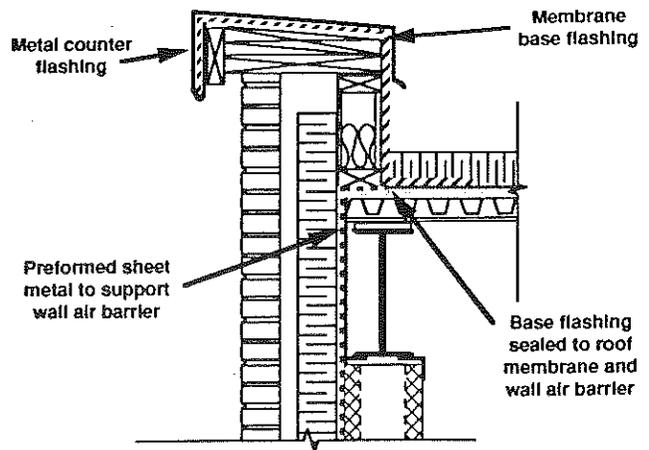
Masonry wall/roof edge intersection (Brand 1990).
